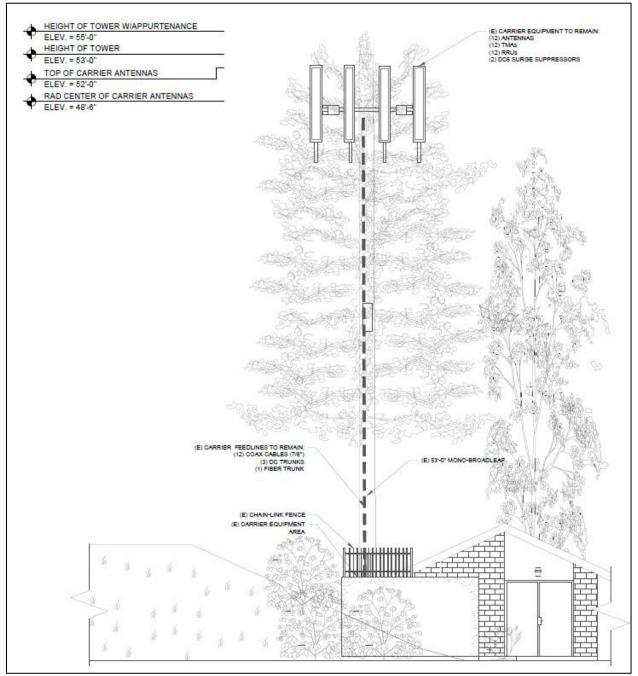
Elevation view of existing AT&T wireless facility. (Source: Plans, Page C-2.2).
